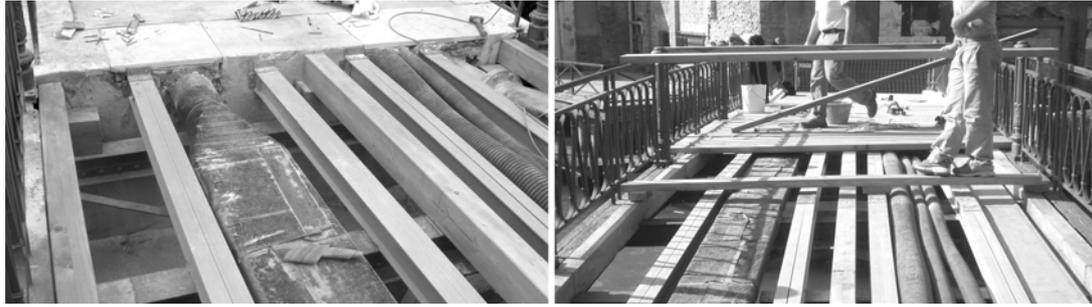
GFRP and wood longitudinal beams before wood deck phase
